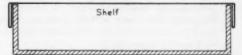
THE HANGER rod is fastened inside the flanges of the shelf
